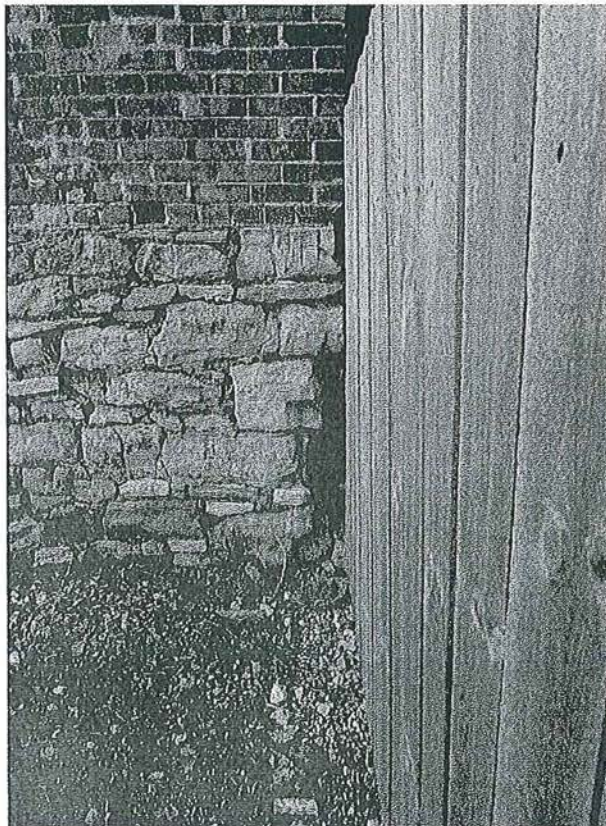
north wall foundation has loose bricks but settlement is not apparent
